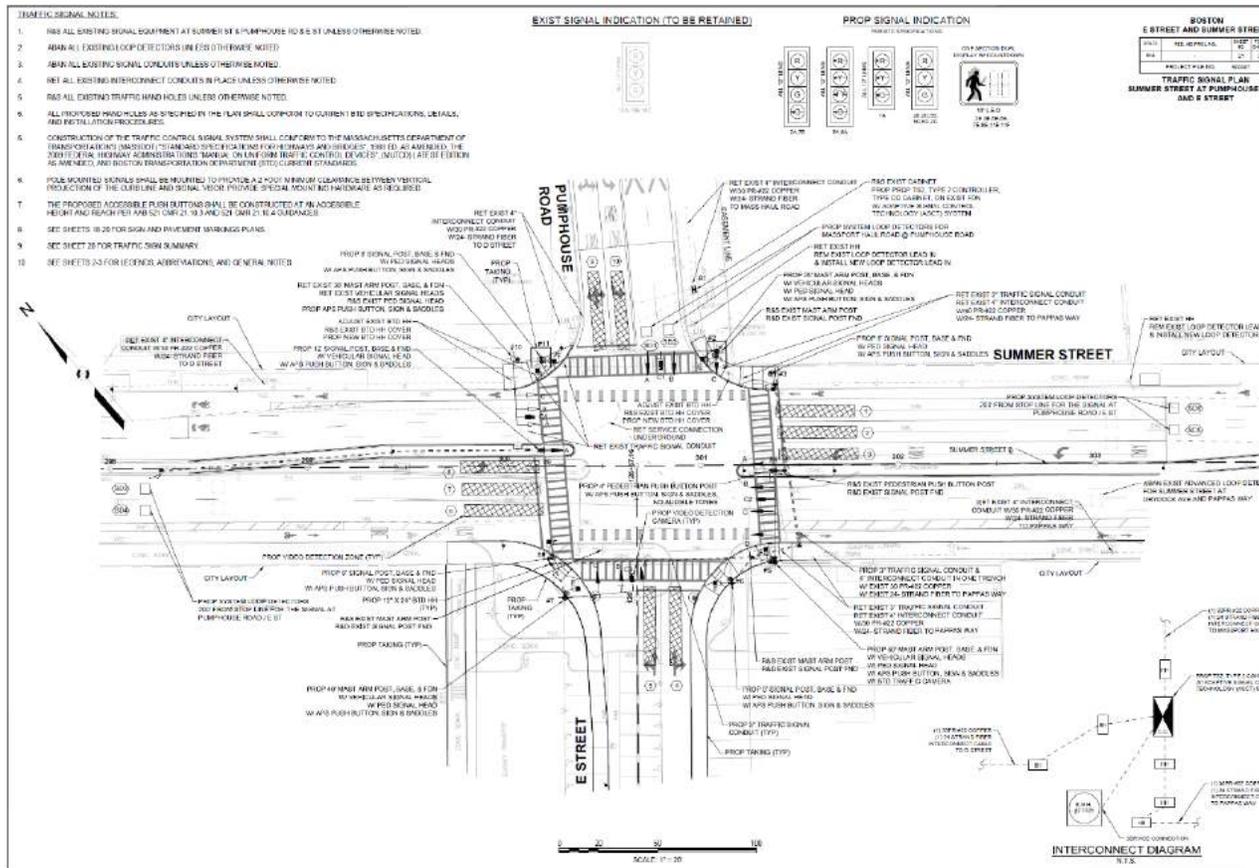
The extension of E Street to meet Pumphouse Road will encourage trucks to access RLFP via Haul Road rather than via the Summer Street/Drydock Avenue/Pappas Way intersection (source: MassDOT)
